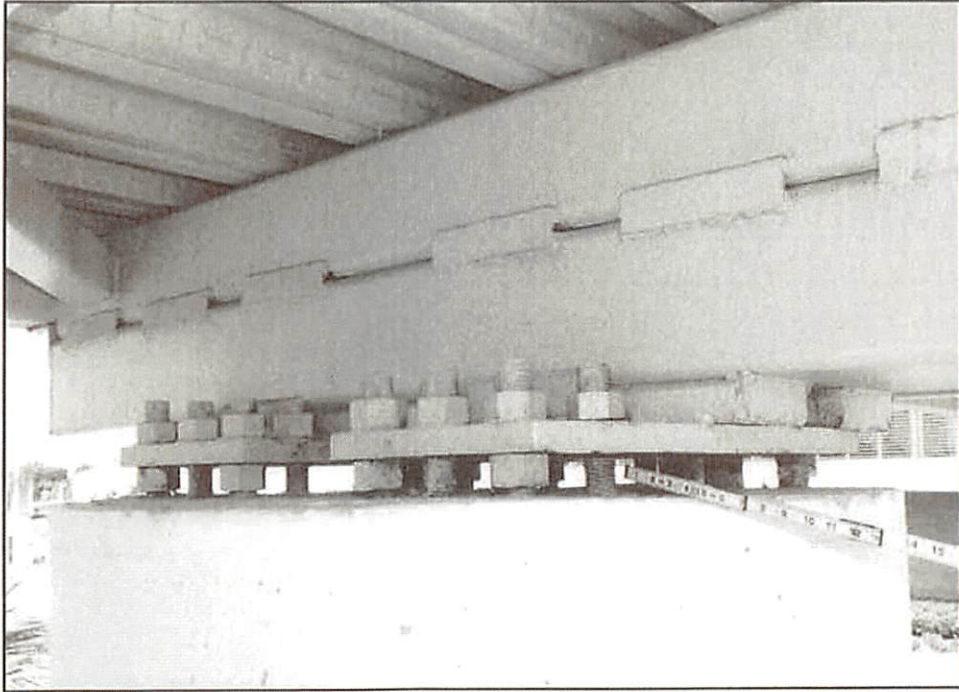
Only 8 out of 24 leveling nuts are installed at the fixed bearing above the east column. There is light surface corrosion on the anchorage hardware and bearing plates.
